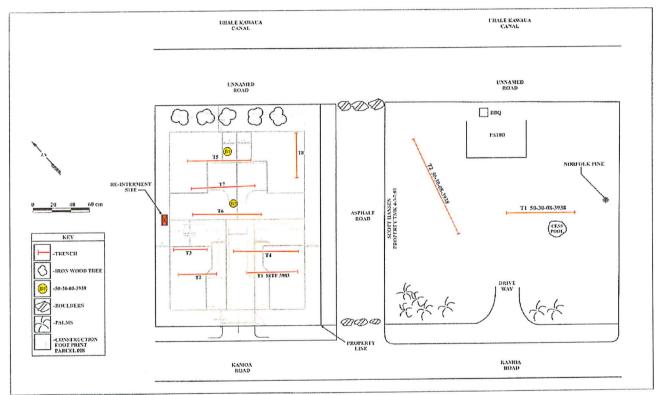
Plan View Map of Project Area Showing Trench Locations.
